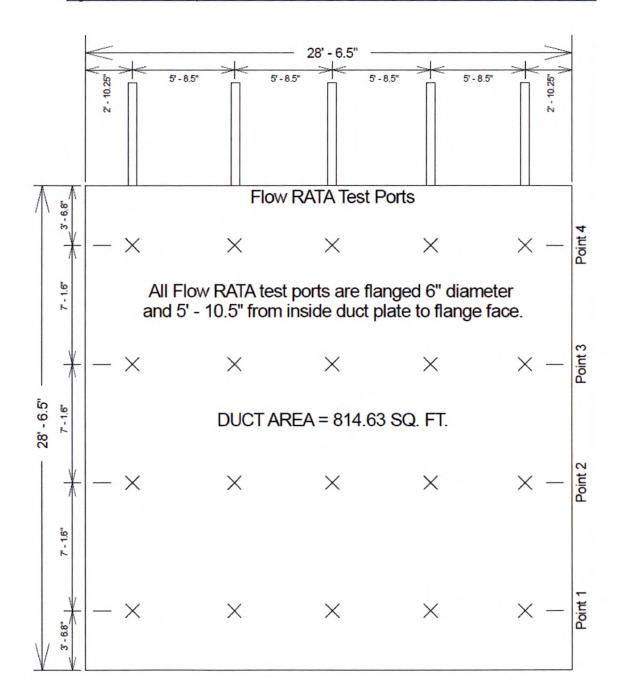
J.H. Campbell Unit 3 Duct Cross Section and Flow Traverse Point Detail
